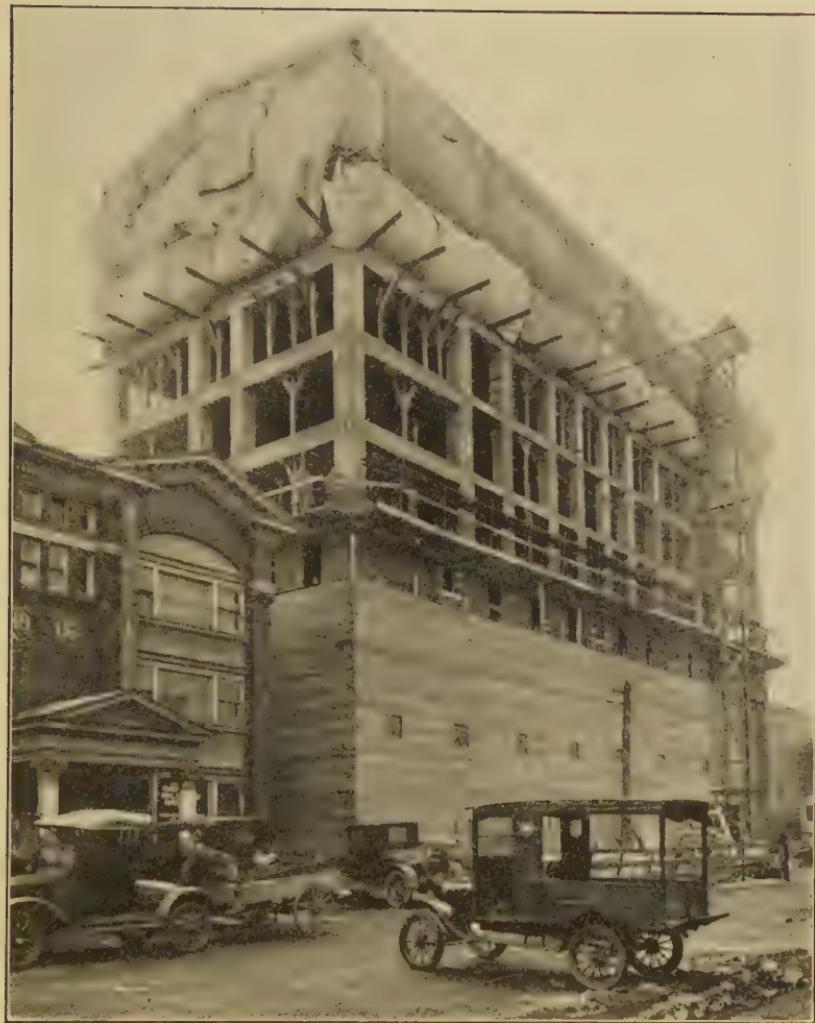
PLATE I.—Housing employed on Piper Hotel building at Madison, Wis.
